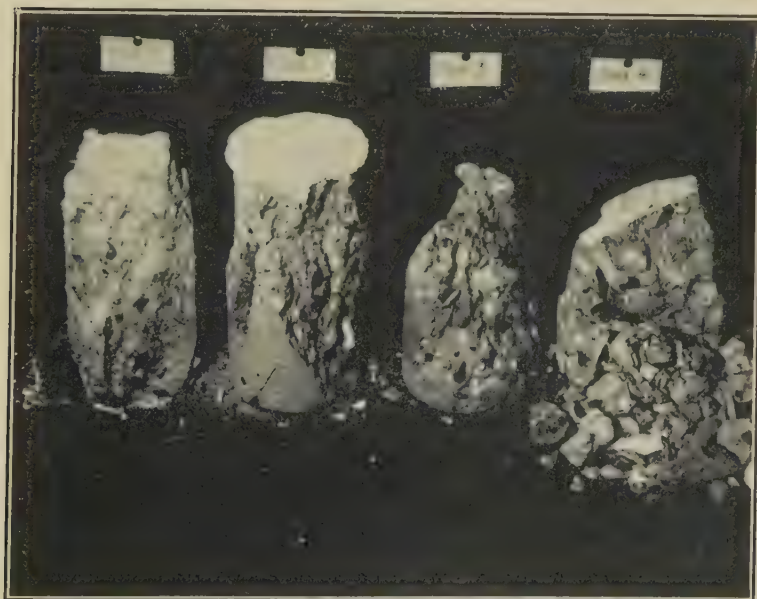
TYPICAL TYPES OF CYLINDER FAILURES.
